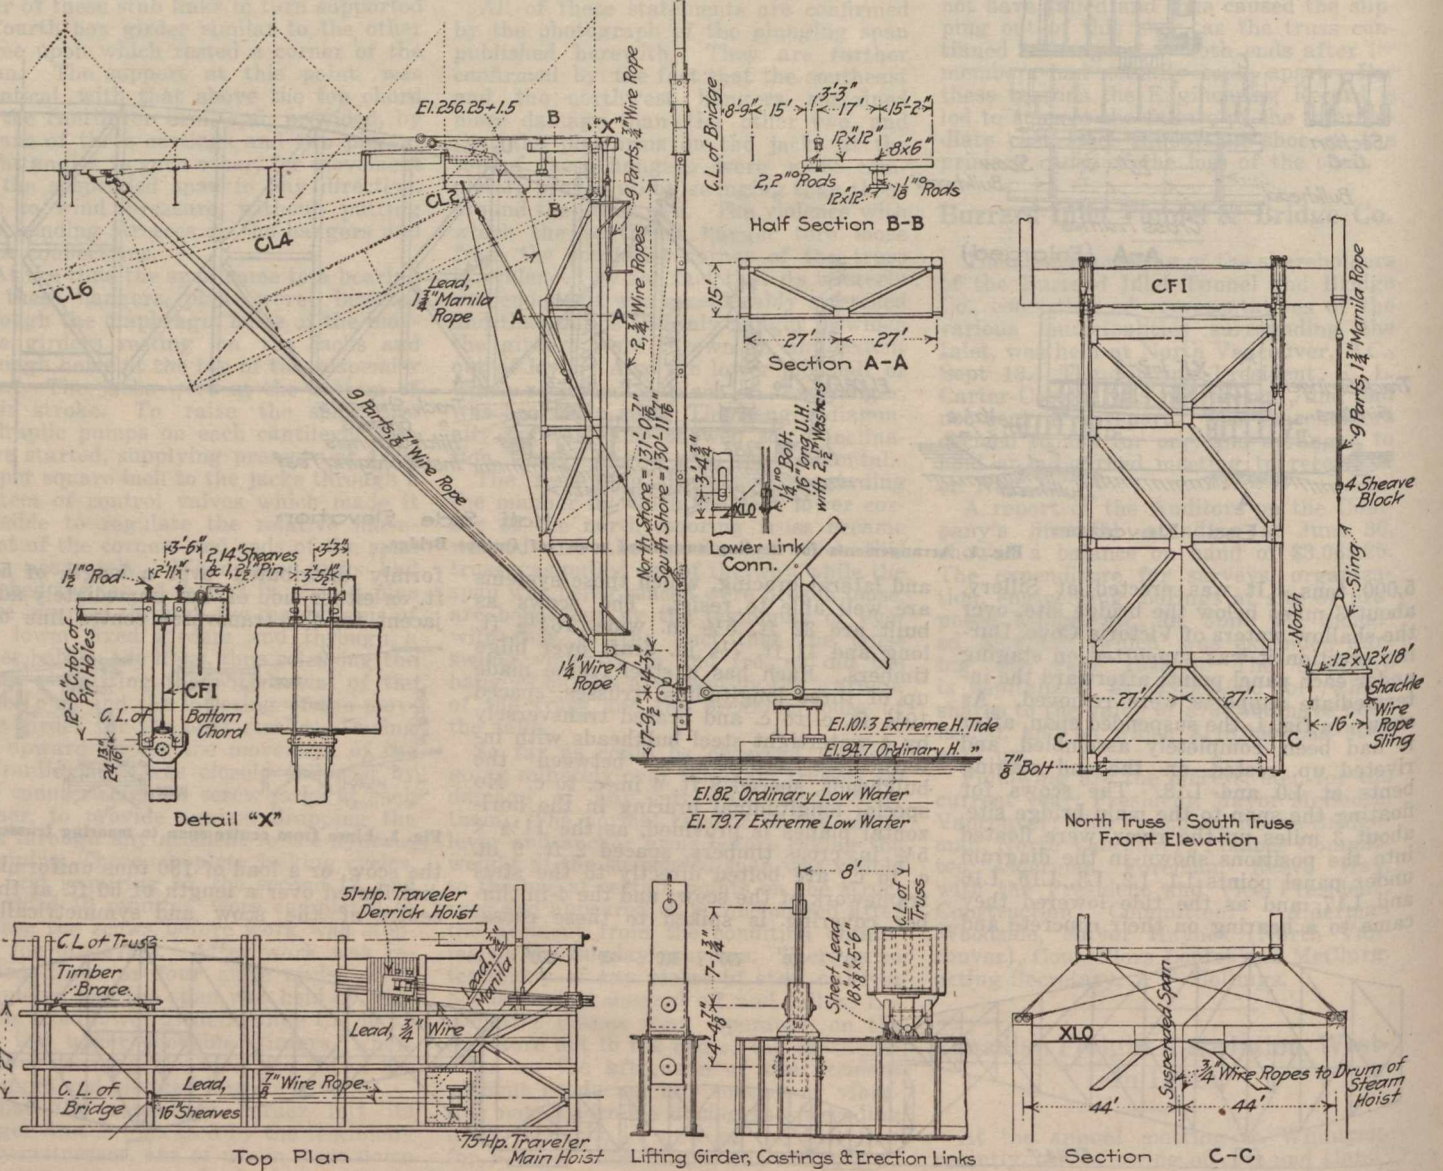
Detail of arrangements for mooring and hoisting suspended span, Quebec Bridge.
